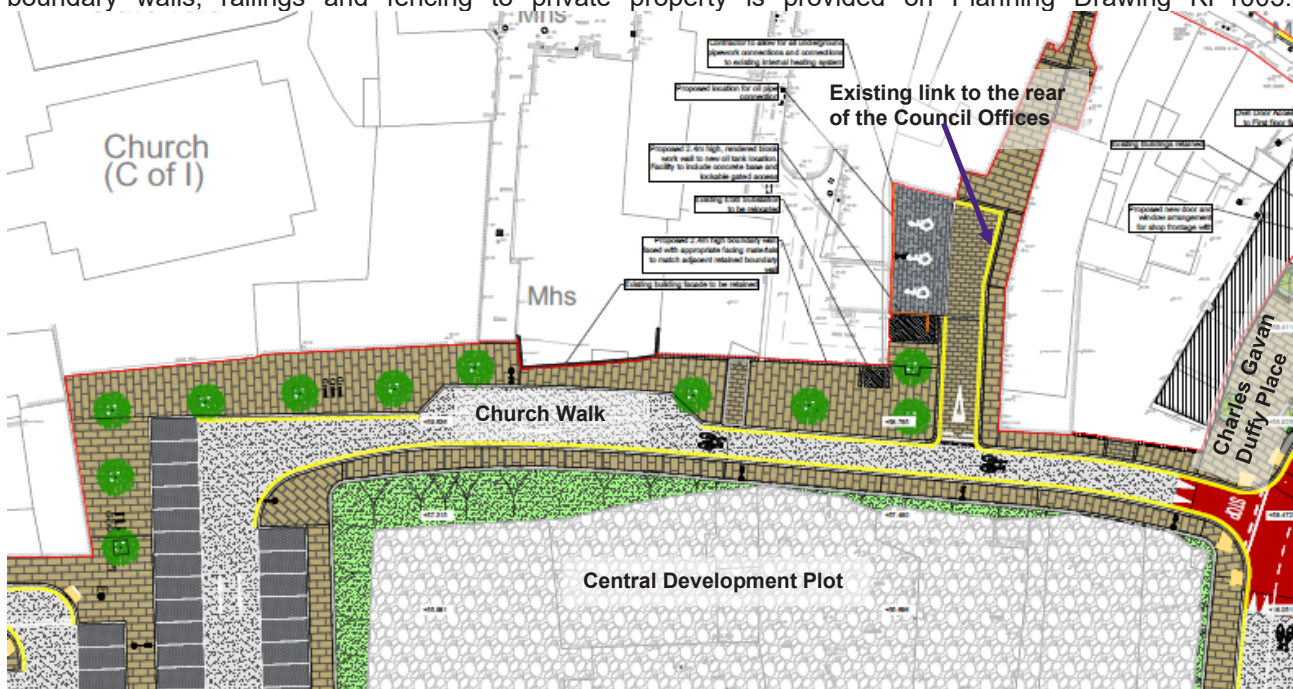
Excerpt from Planning Drawing GA 1001 showing the proposed Church Walk
